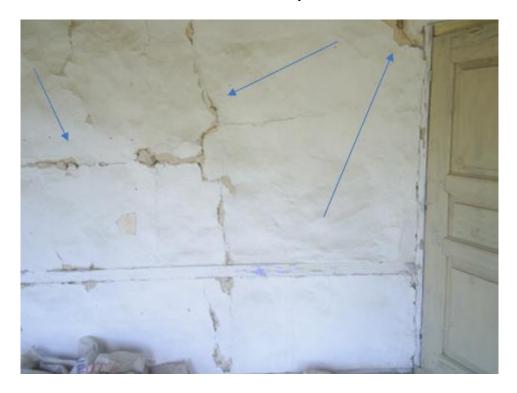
İbrahim Pilavcı House of crack caused by mechanical action on the wall surface.
